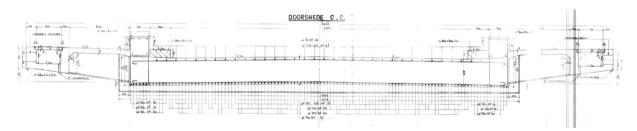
Cross-section over the support. Dimensions in cm, except for bar diameters in mm.
